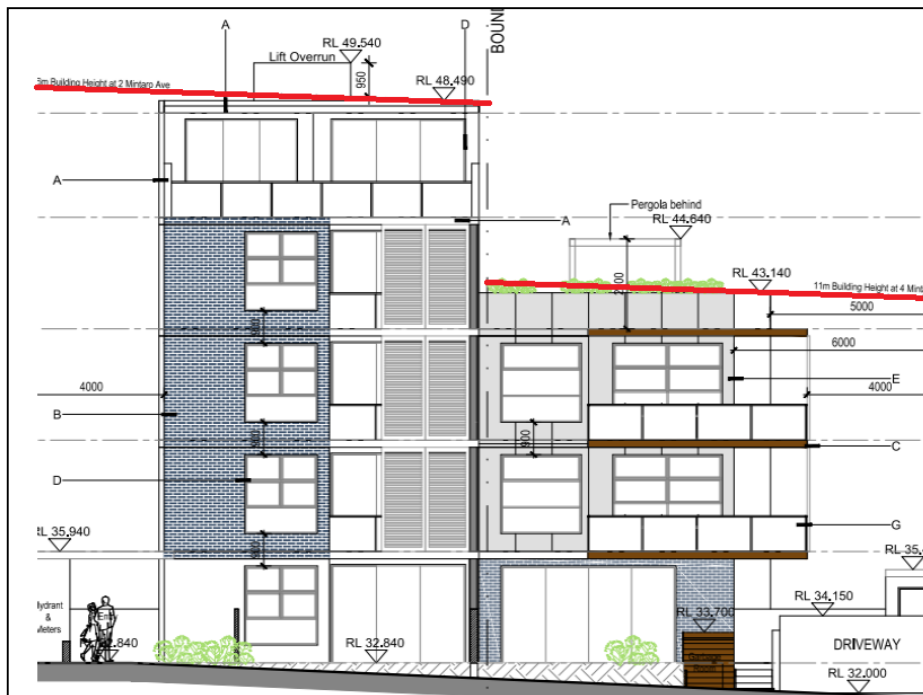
View of northern elevation noting the extent of the proposed building height variation.
